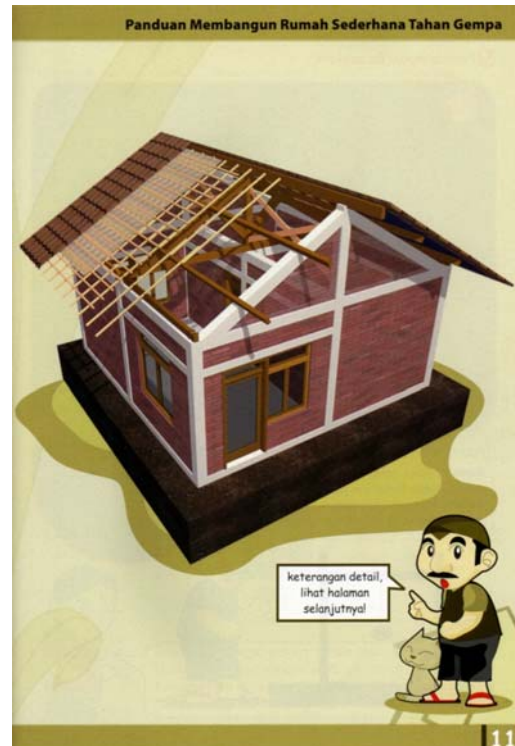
House built with RC frame infilled with masonry (Suryabrata et al, 2007)
